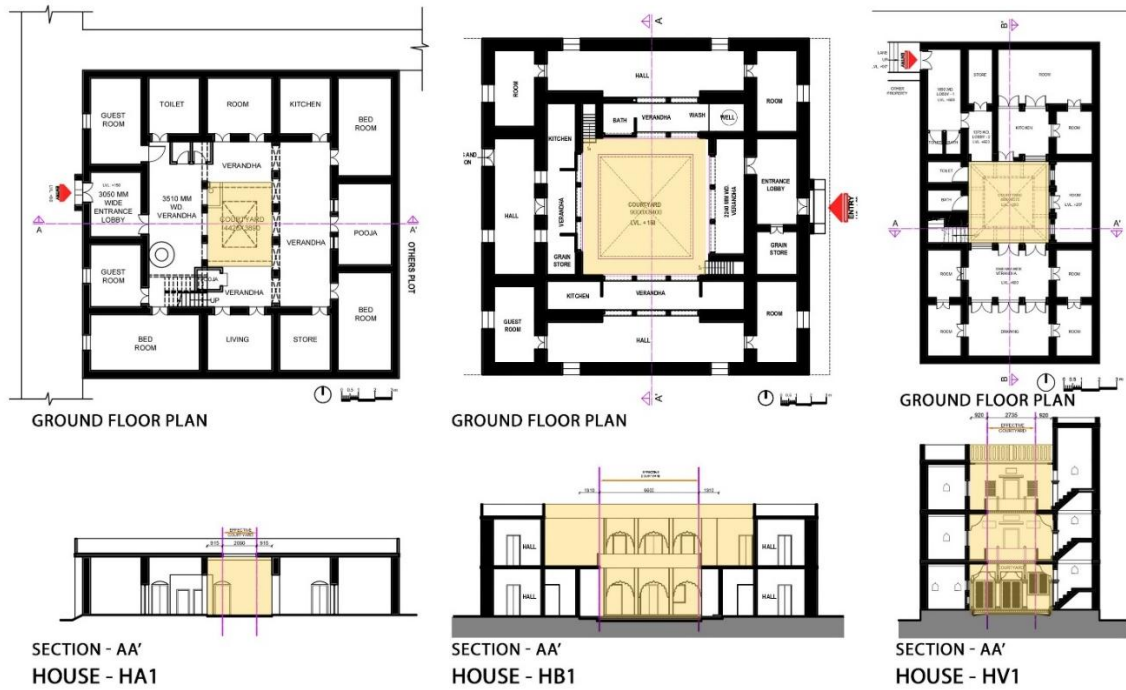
Plans and sections of the selected Traditional house (Source: Author).
